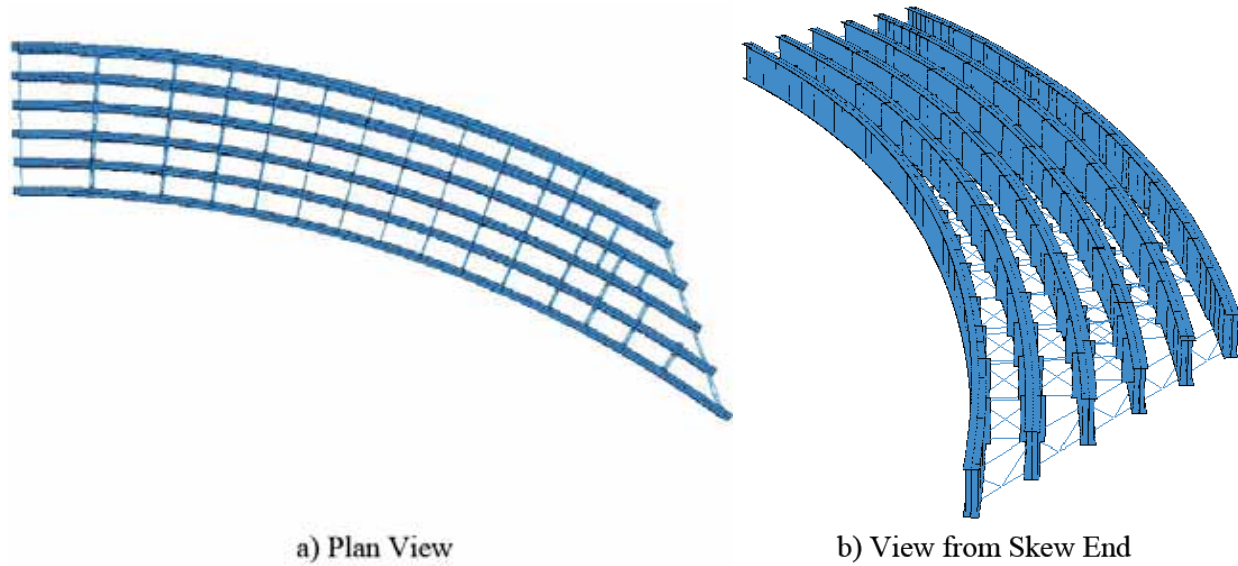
Plan and Isometric Bridge Modeled by Chavel (2008)
